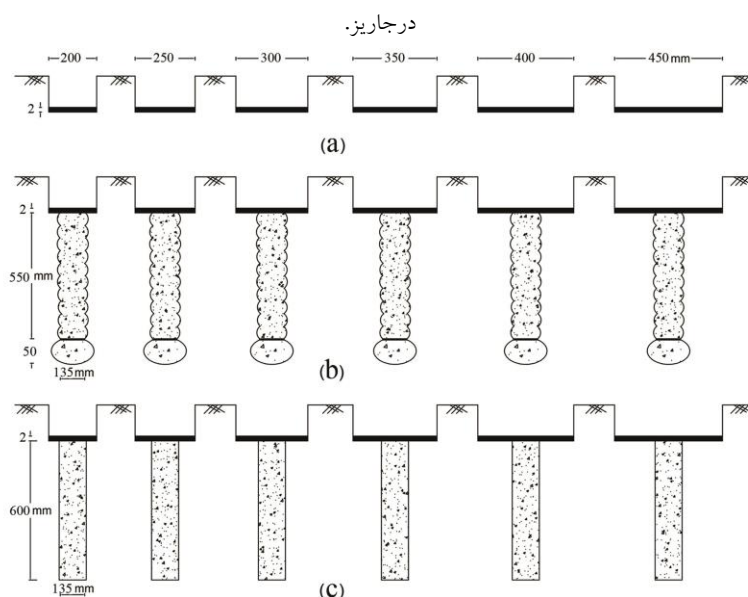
The measured details of the test elements include; (a) spread circular footings, (b) footing-rammed aggregate piers, and (c) footing-cast in place piers.
